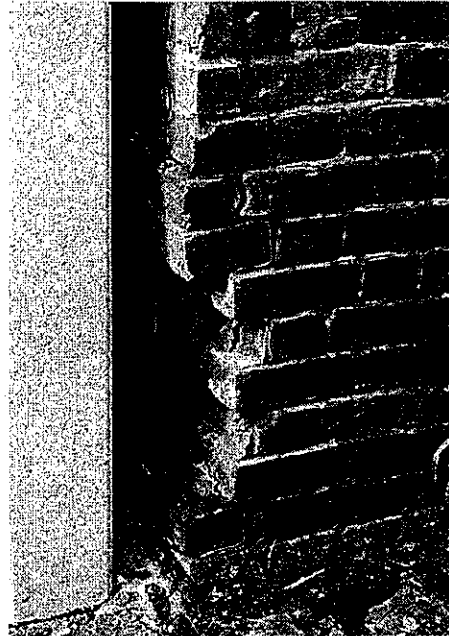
Exterior, Office & Toilet Wing, detail of damaged/partially demolished north-west corner of west elevation.
